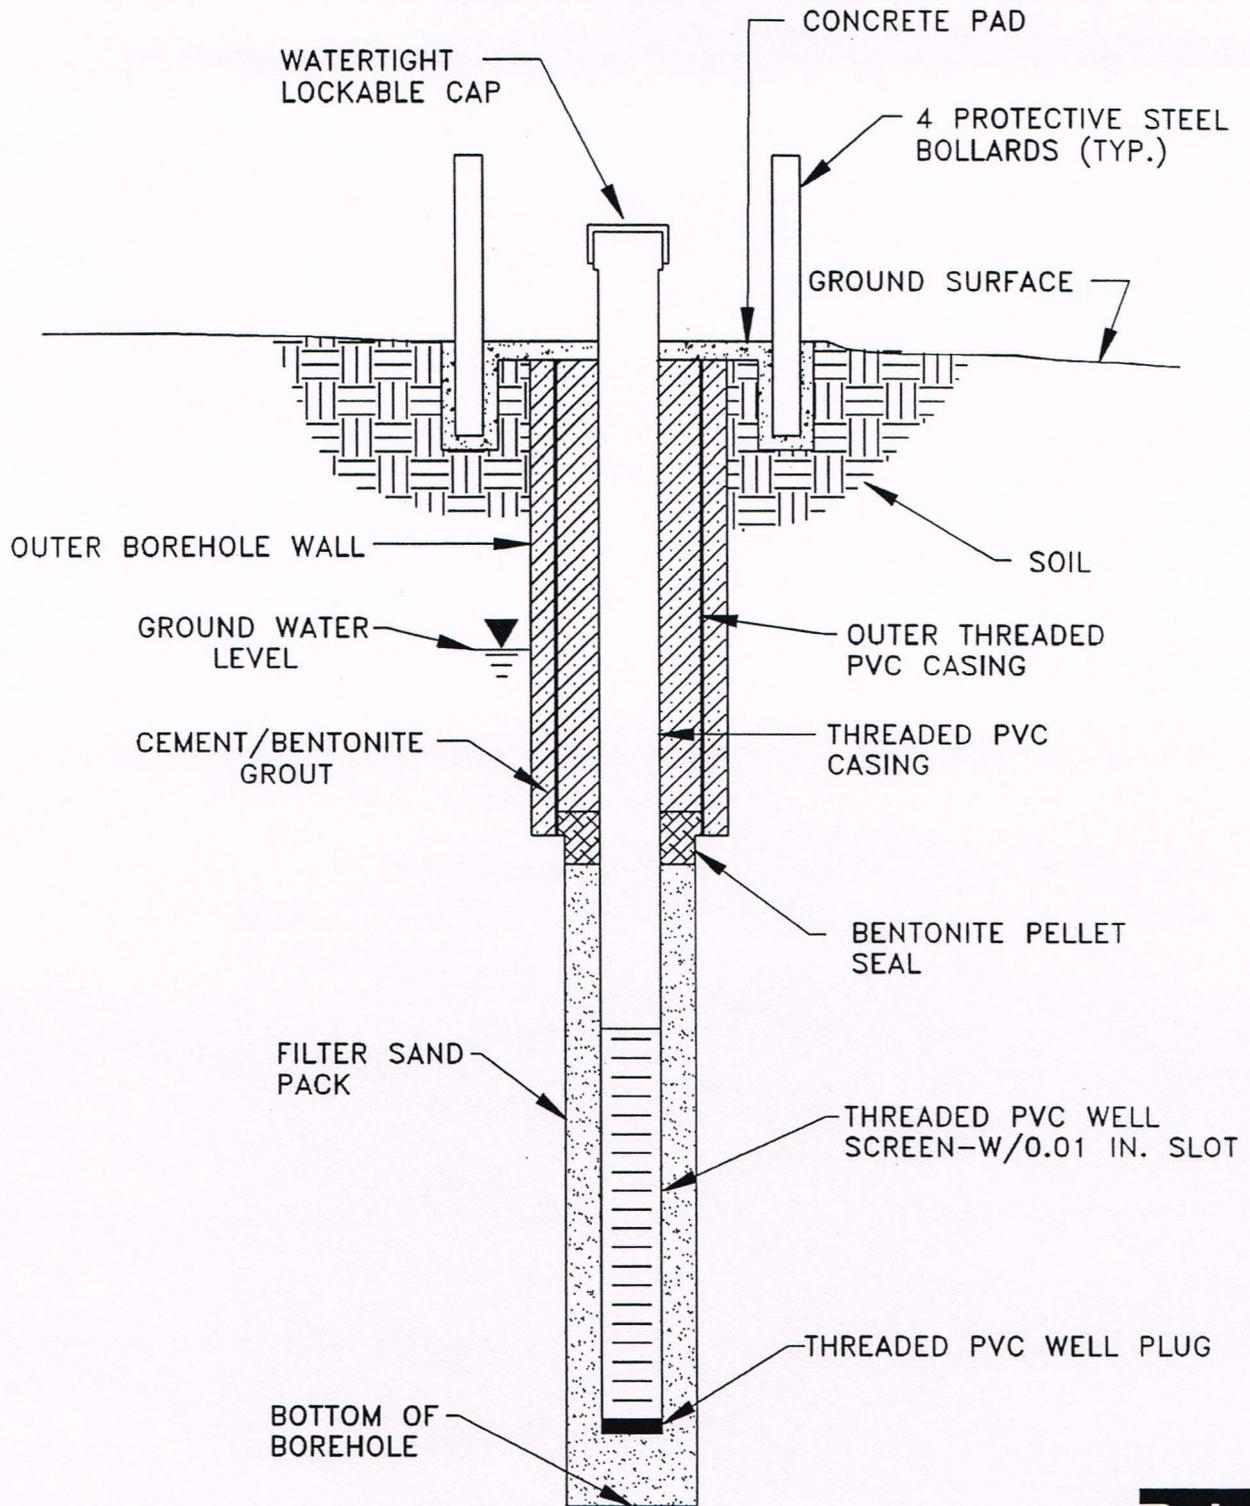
is a typical Type II deep monitoring well construction diagram.
